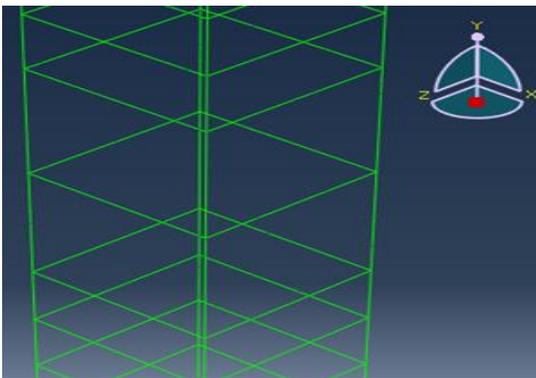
Undeformed shape of the reinforcement embedded in specimen R120Am16
